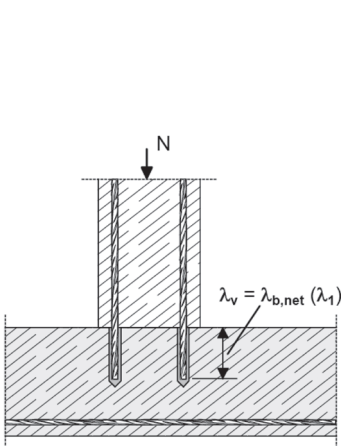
Rebar connections for items primarily subjected to compression. The rebars are subjected to compression.
